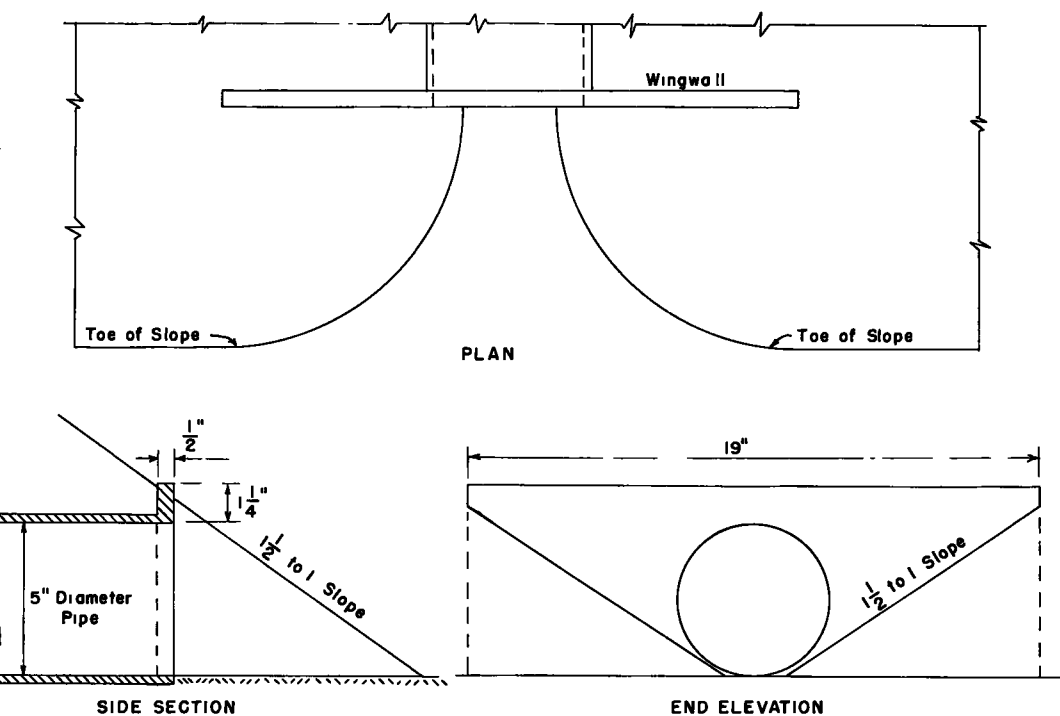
Details of Straight Wingwall Inlet to Square Edged Pipe.
